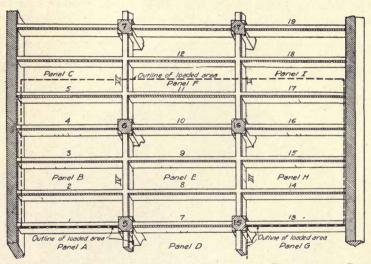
CABINET PROJECTION SHOWING BEAMS AND GIRDERS AND POSITION OF TEST CRACKS.
